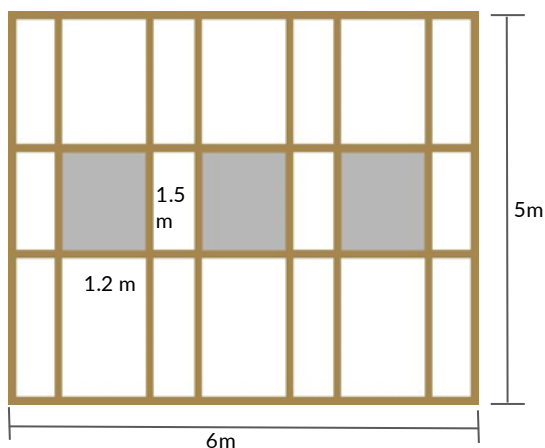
Wall elevation of one bay showing opening sizes and vertical reinforcement positions
